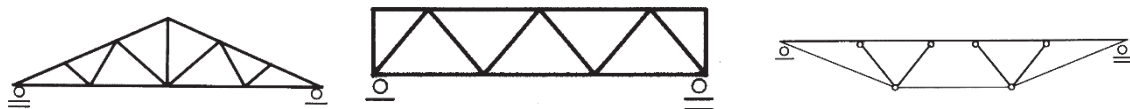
Duo pitched truss; Lattice girder; Under-tied beam (Herzog & Natterer, 2004)
